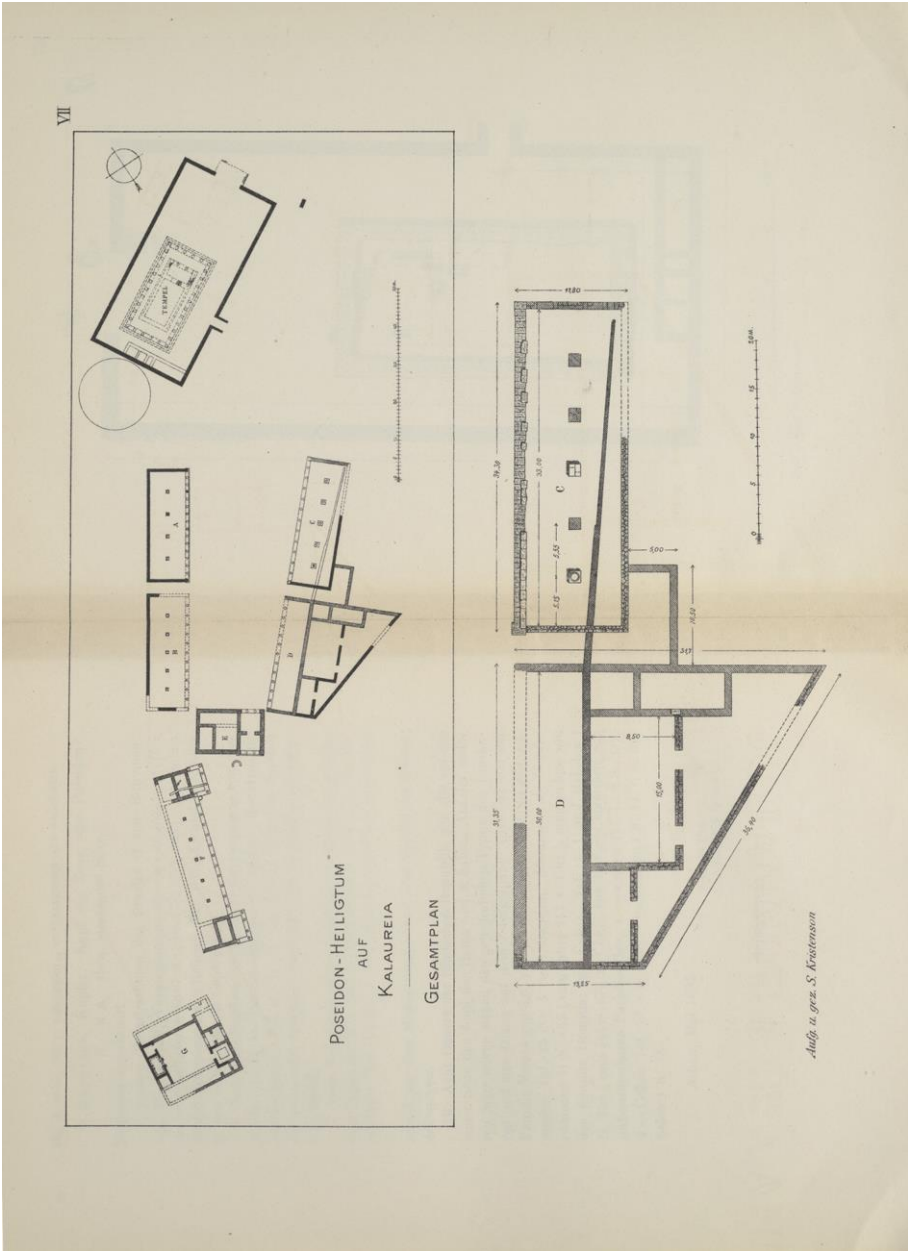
Site plan by Sven Kristenson. From Kjellberg & Wide 1895:plate VII. Photo: Royal Library, Stockholm.
